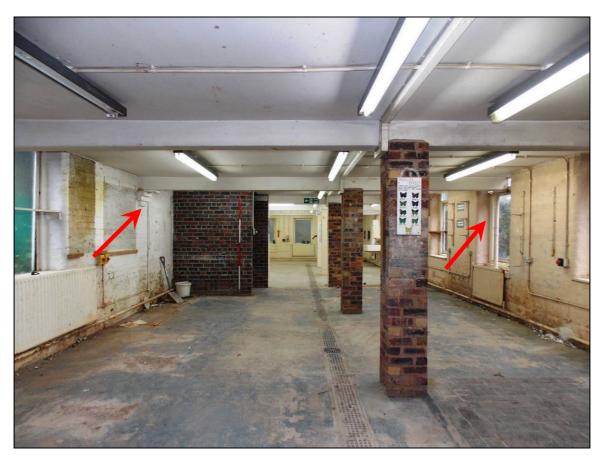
Central beam with ends supported by a column and a brick corbel (arrows), looking north (scale 2m).
